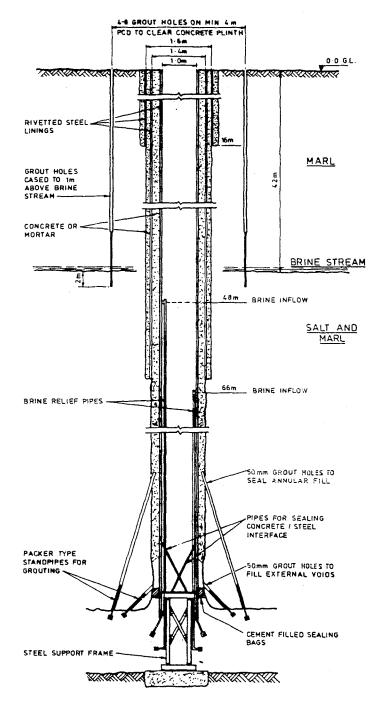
Grouting Arrangement for Sealing of Emergency Shaft at Varangeville Mine France.
